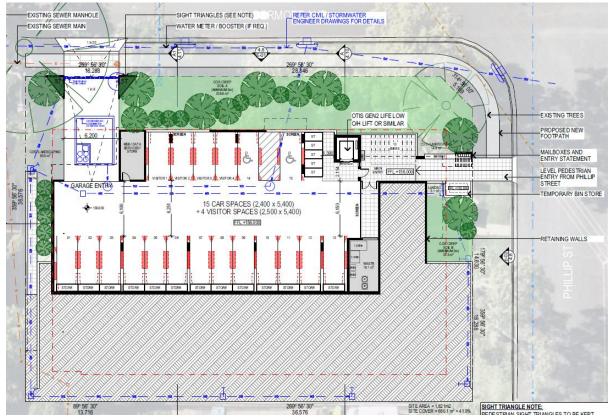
| Proposed development layout plan at ground floor / Level 1, *source: Raunik Design Group
